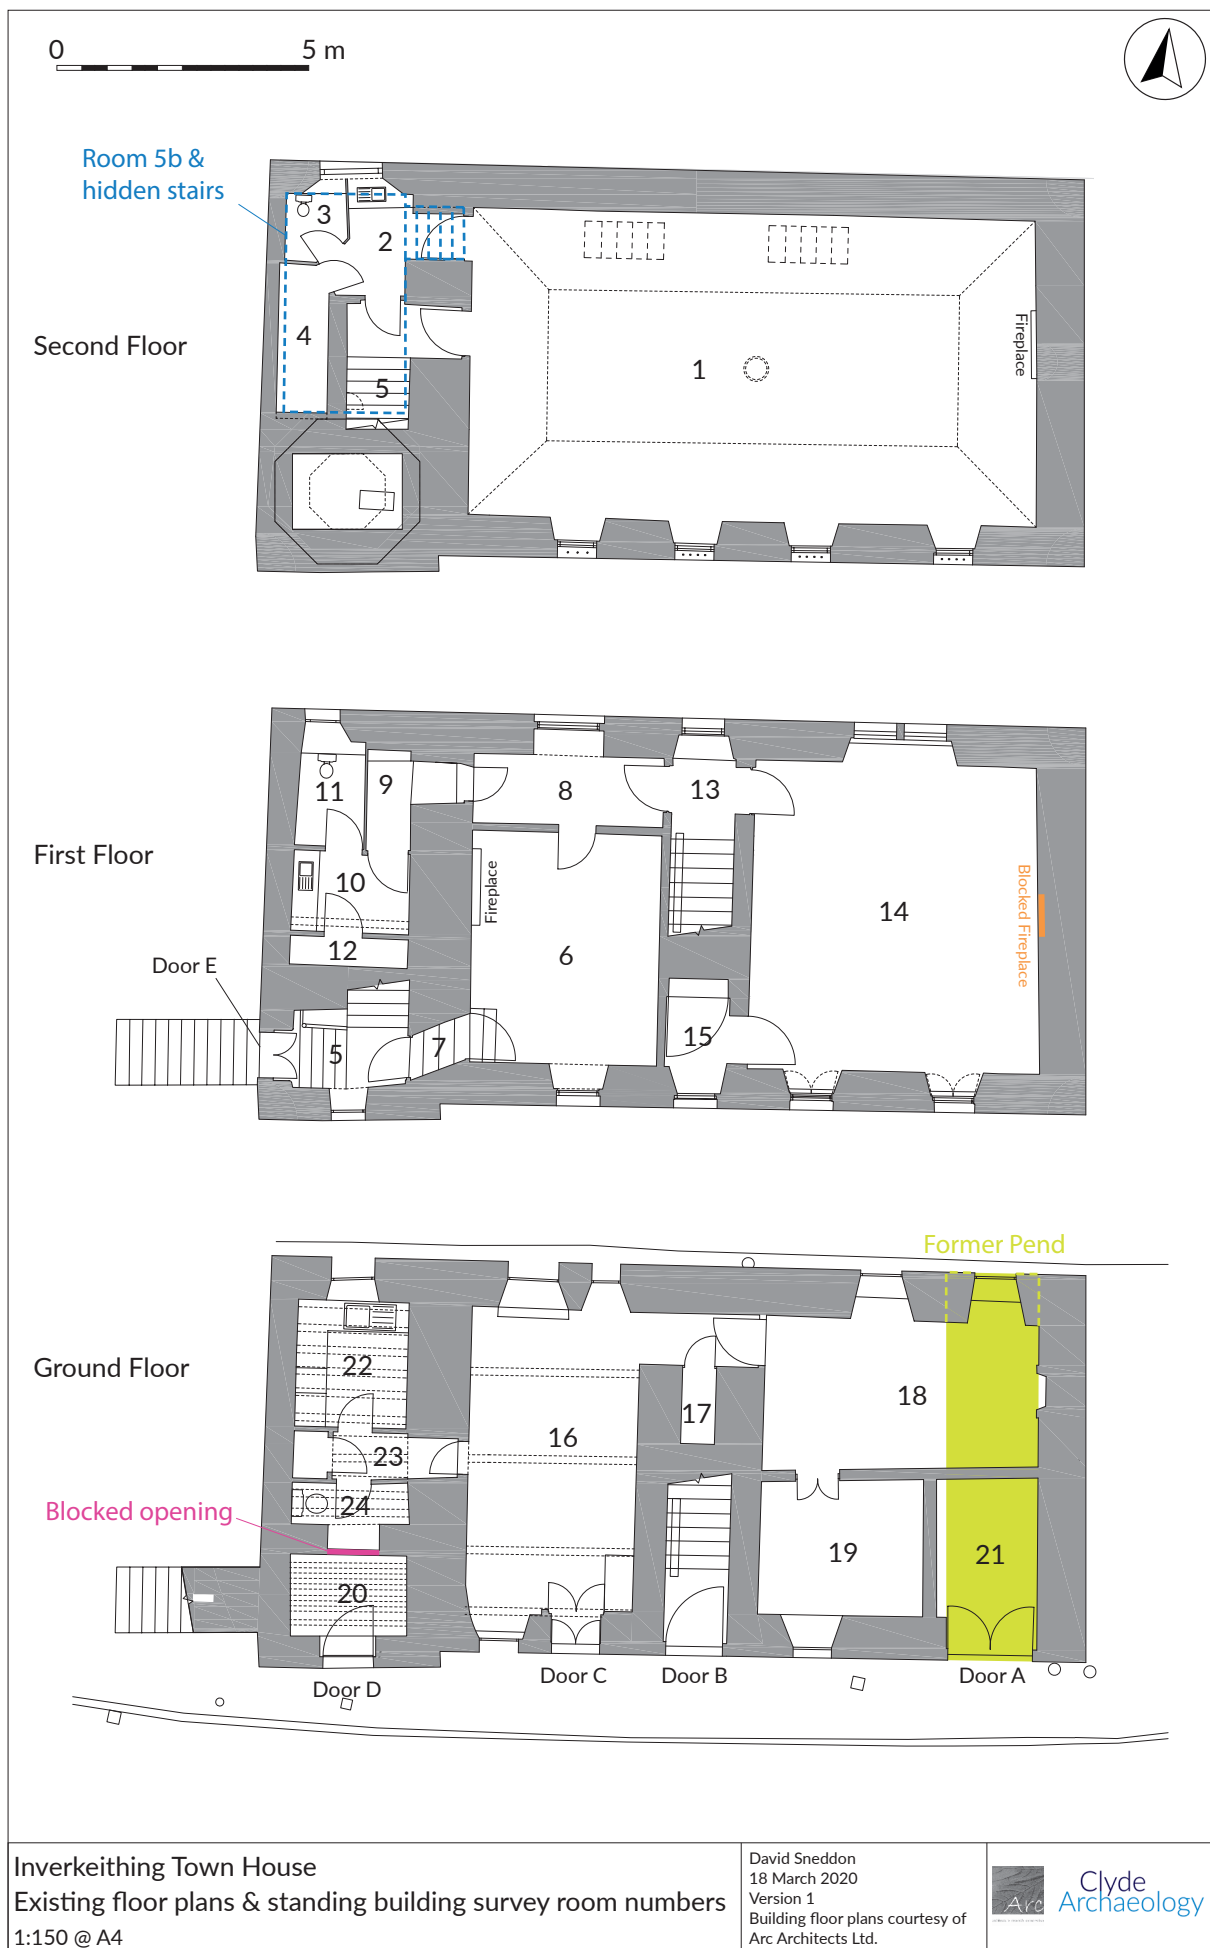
Annotated floor plan of Town House based on drawing provided by Arc Architects Ltd.
